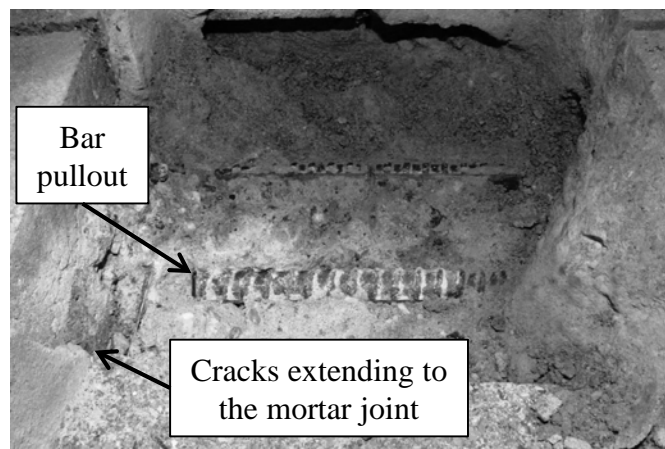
Internal damage and crack propagation observed in specimens with 50 mm splice-bar spacing.
